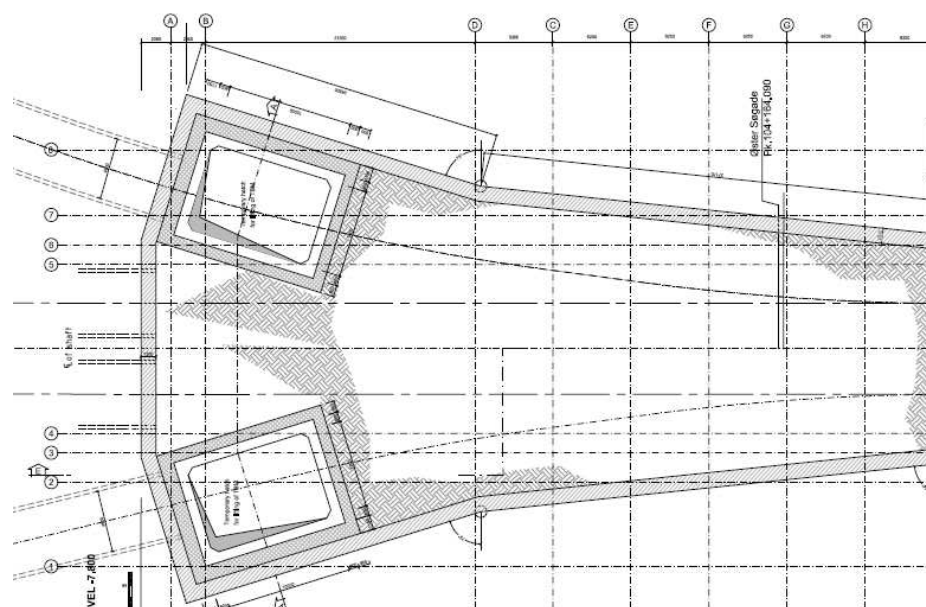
Part plan of Øster Søgade showing TBM extraction 'Chimneys'.
